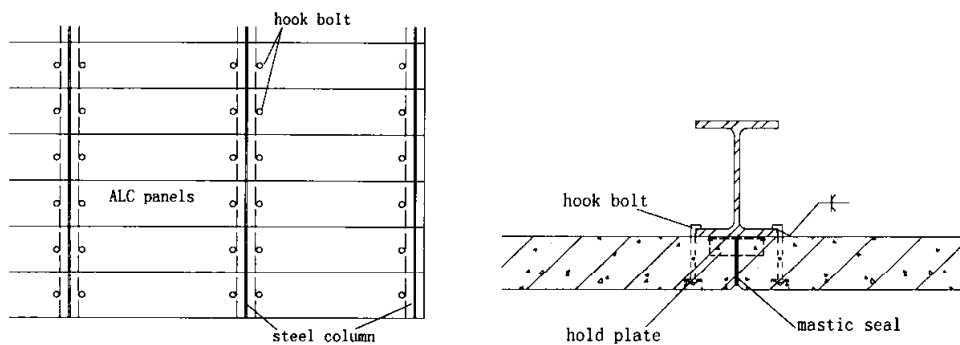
Connection of light-weight concrete wall panels and steel column
